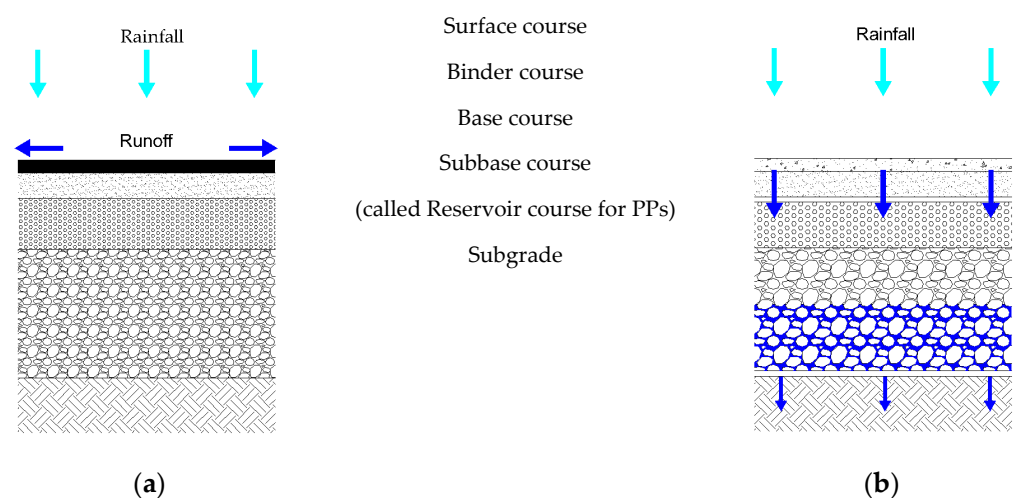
Schemes of traditional pavement (a) and pervious pavement (b).
